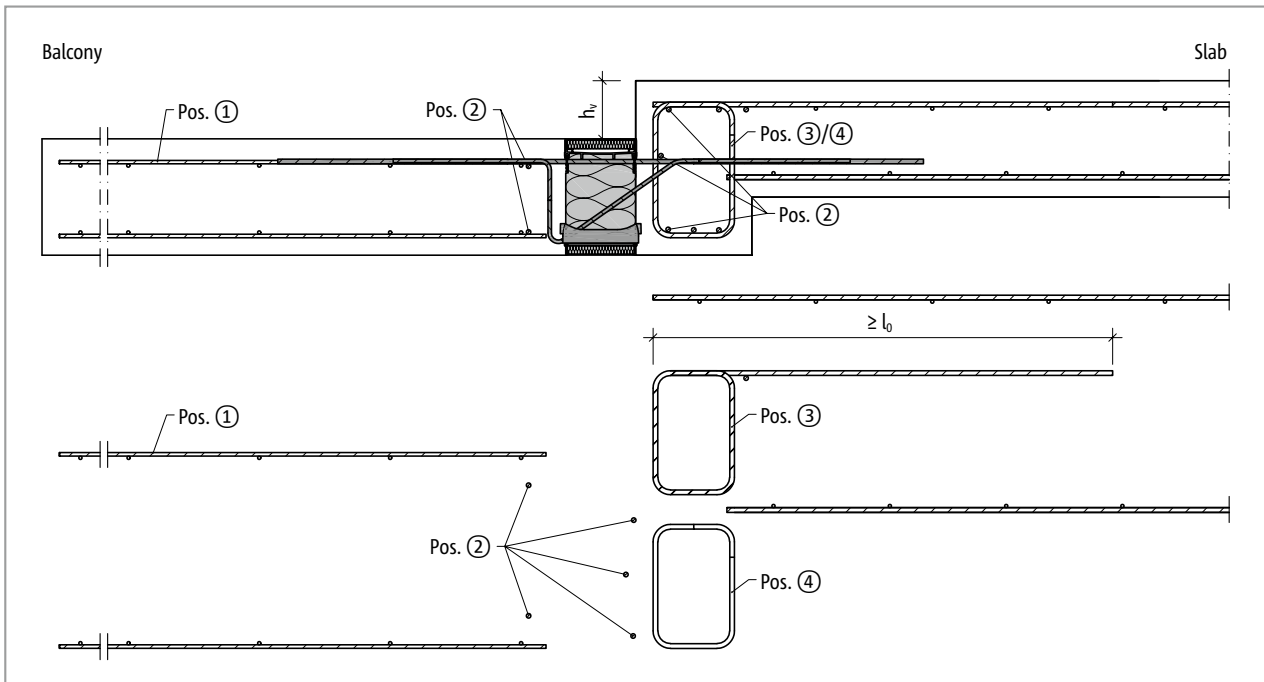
Schöck Isokorb® XT type K: On-site reinforcement for small height offset
